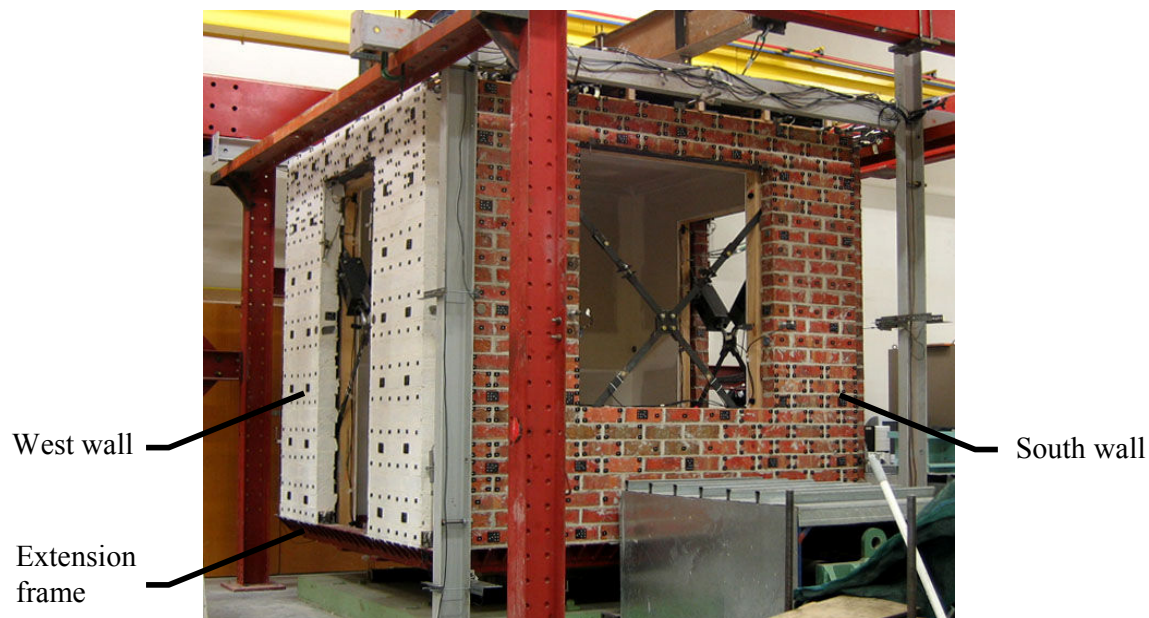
Specimen instrumented and setup for testing in north-south direction.
